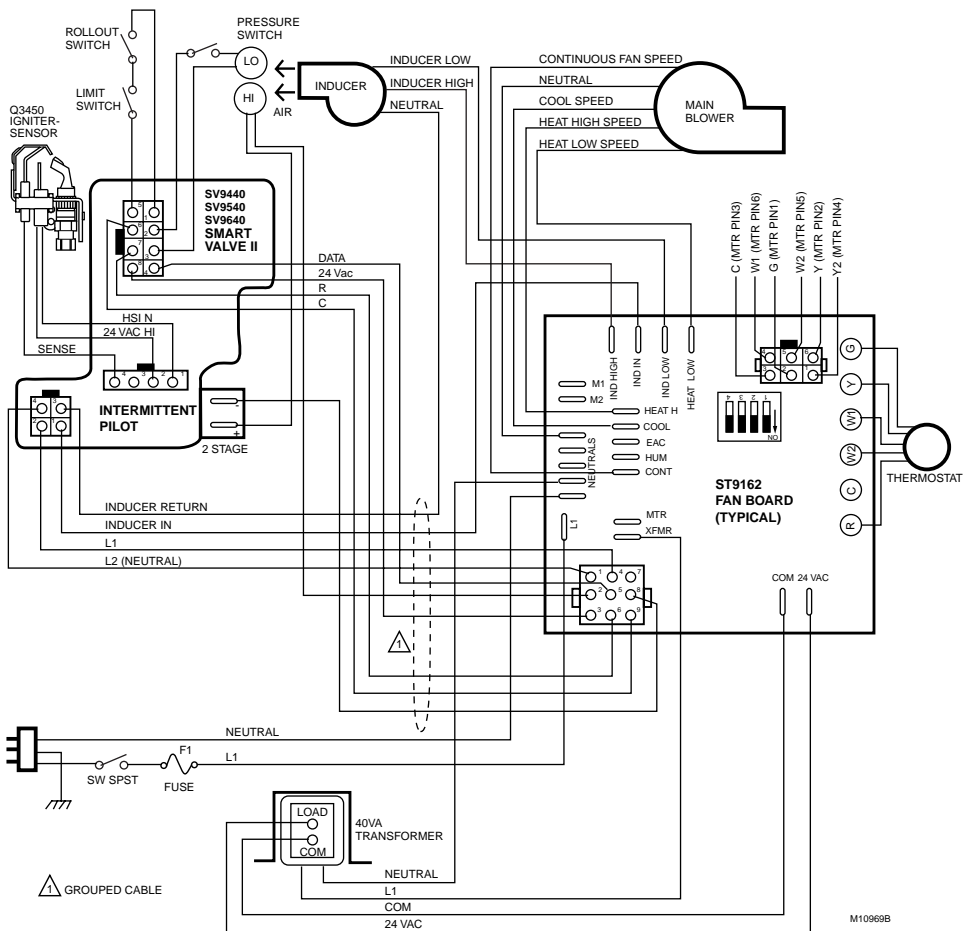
Typical ST9162 wiring connections with SV9440, SV9540 or SV9640 SmartValve™ System Control.
